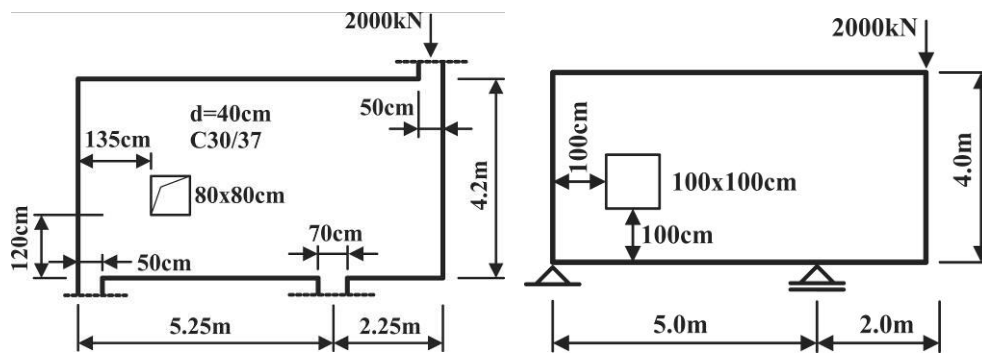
Reinforced concrete wall with an opening – left and static system - right
